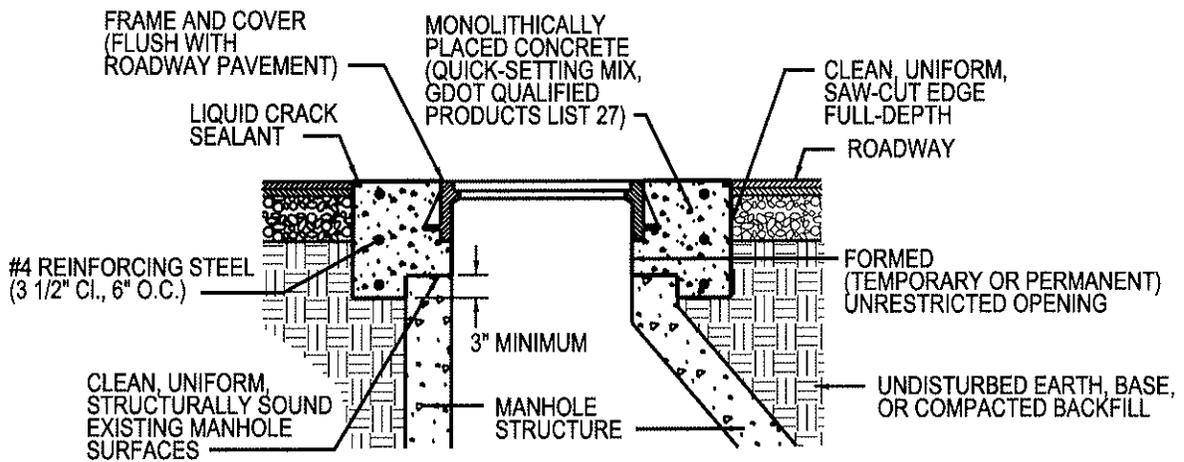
COBB COUNTY WATER SYSTEM MANHOLE ADJUSTMENT IN PAVEMENT
